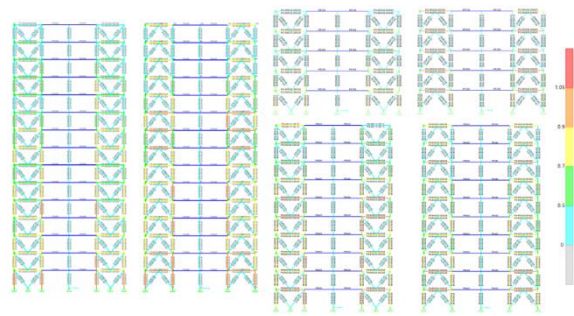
Capacity Control of Beams and Columns at the Bracing Bay in 5, 10, and 15-Story Structures with Bracing Types V and inverted V-(chevron)
